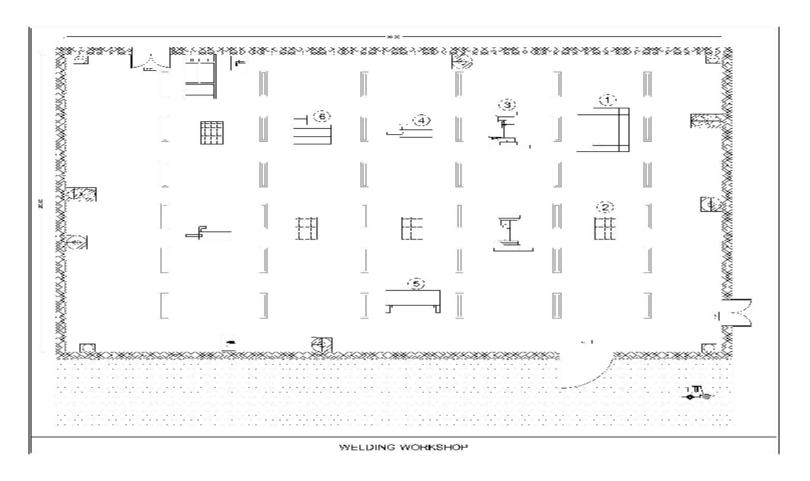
The Welding Workshop Redesigned Workplace
